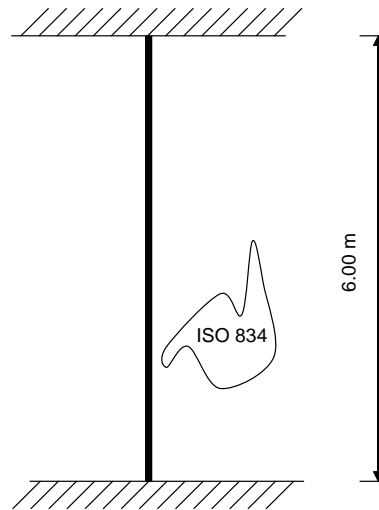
Principle sketch of the test set-up of the investigated column
